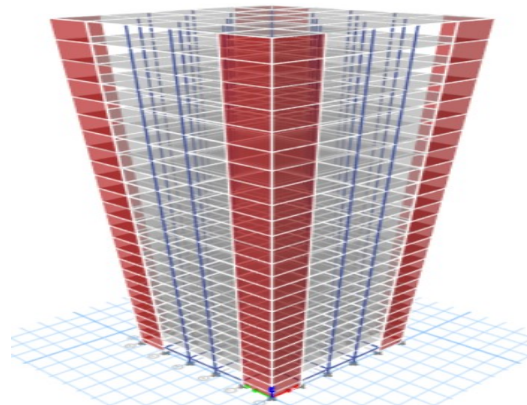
D View of RC framed building with shear wall (From base to 25th story)
